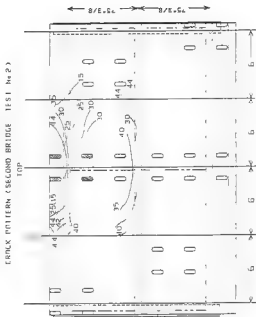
Top Cracking Pattern (Second Bridge - Test No 2)
